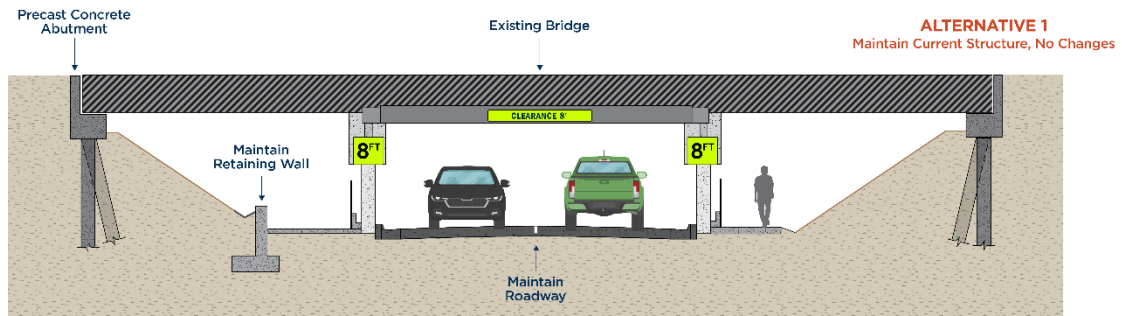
ALTERNATIVE 1: EXISTING BRIDGE STRUCTURE
